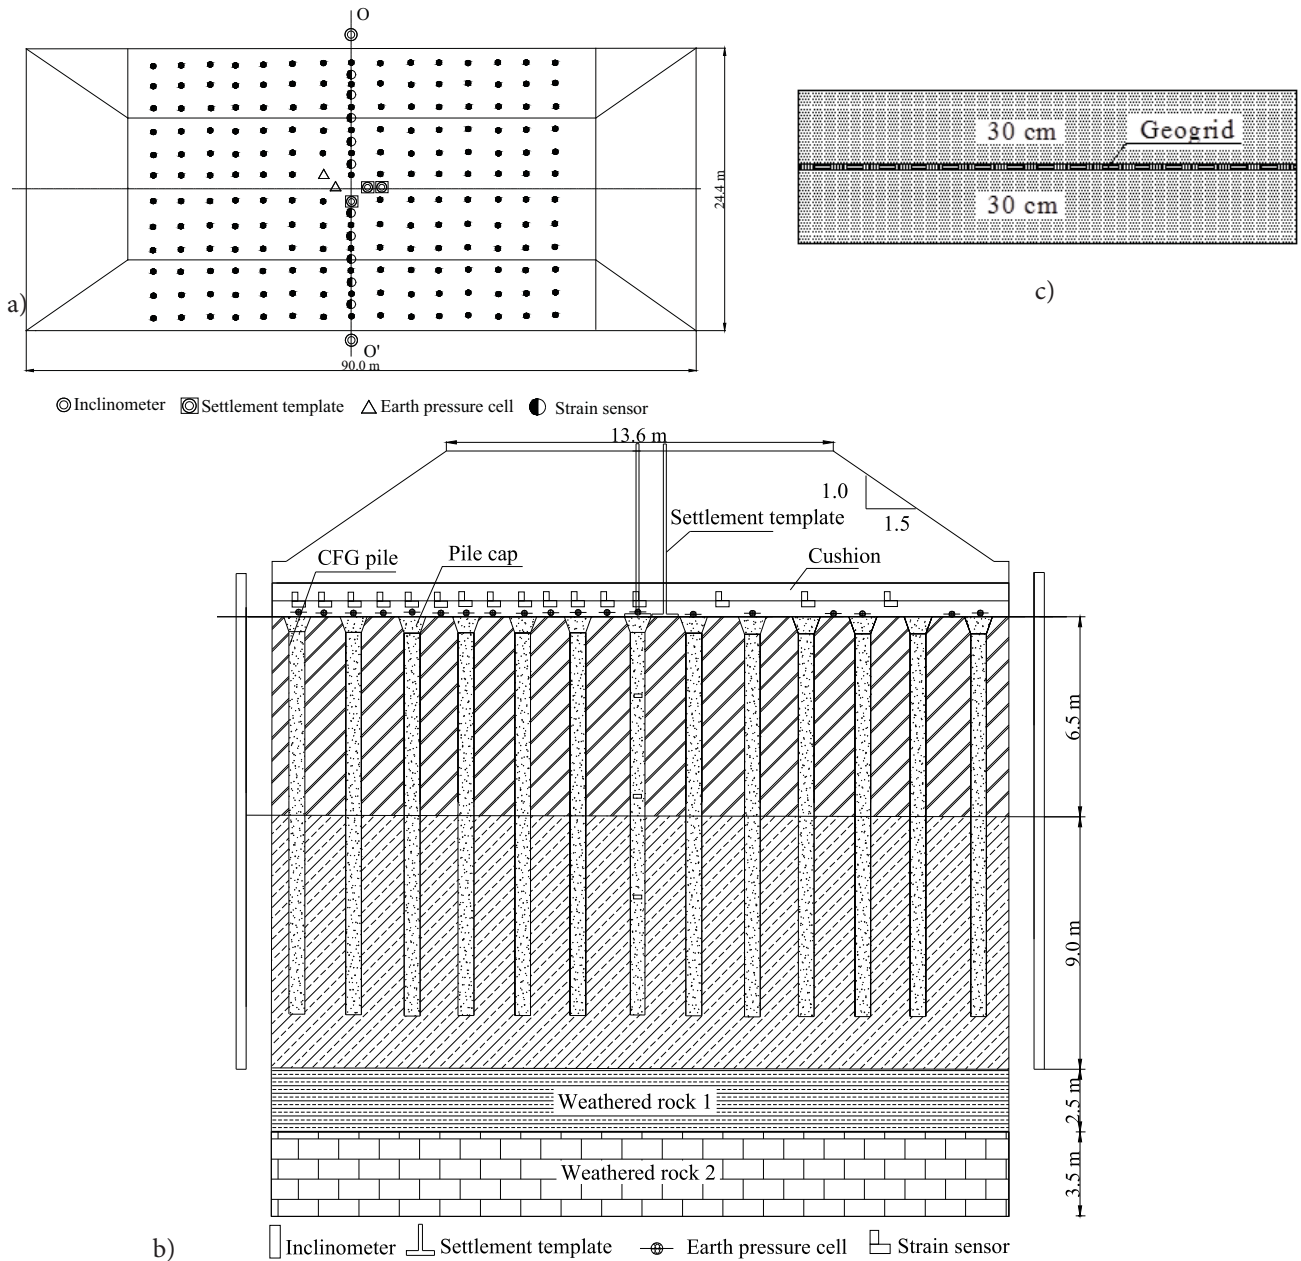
Plan view and cross-section of the test embankment in the Fengyang high-speed railway: a) Plan view of the experimental site at Section A; b) Cross-section of the embankment; c) Structure of the cushion.
